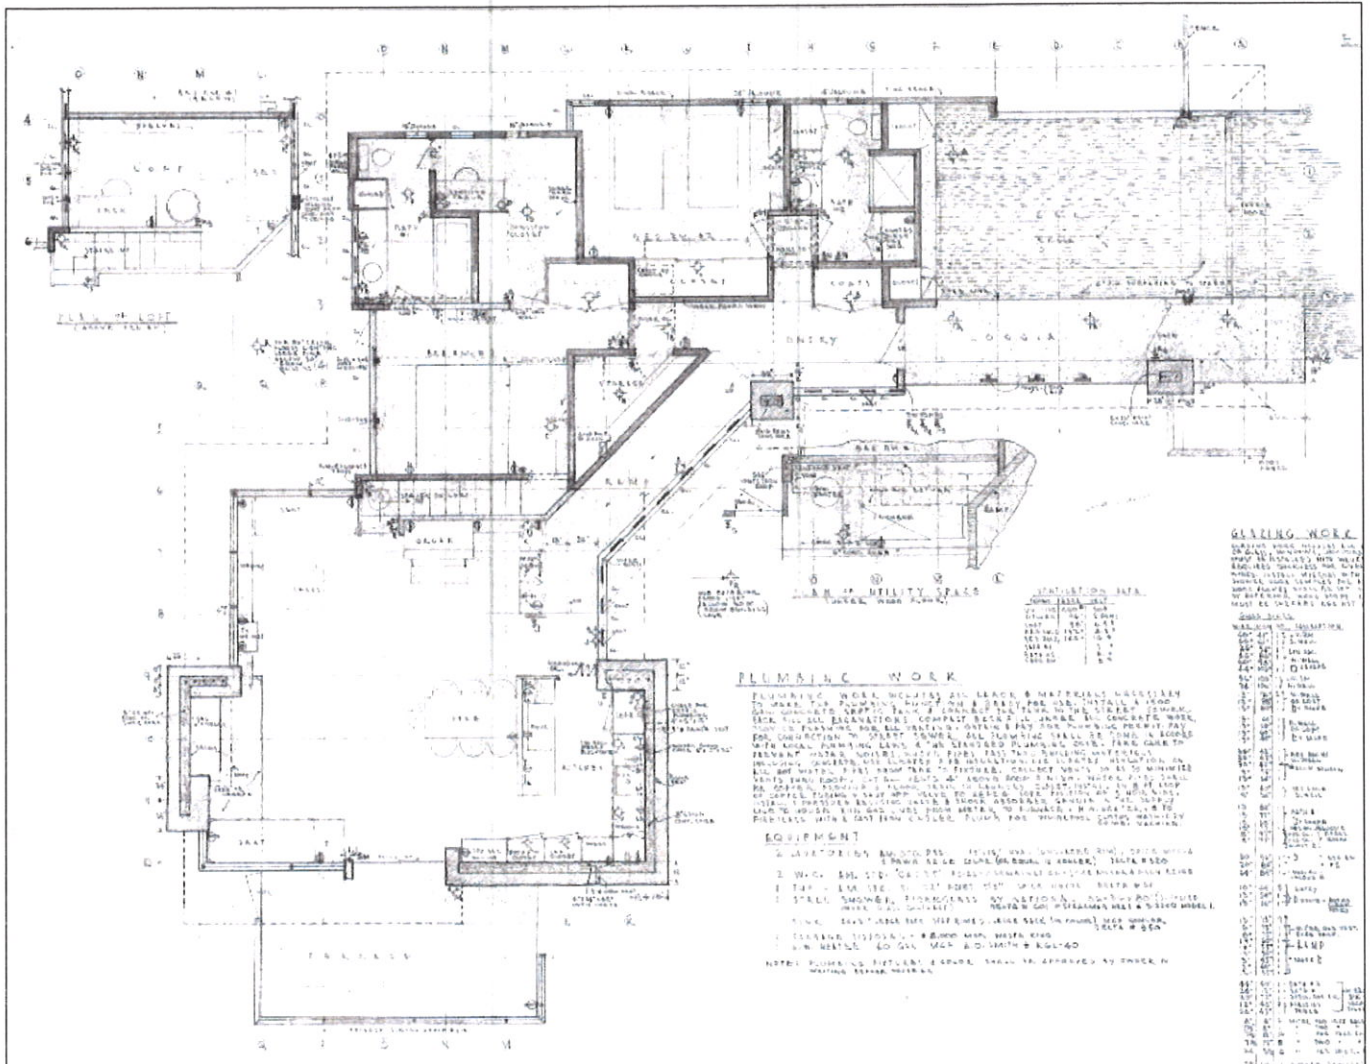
Floor plan for Mark Mills' original 1967 design of 3044 Cormorant Road.
